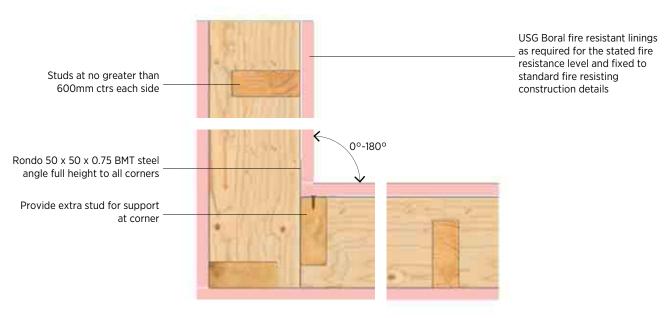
Staggered Timber Stud Wall - Corner Junction Detail
